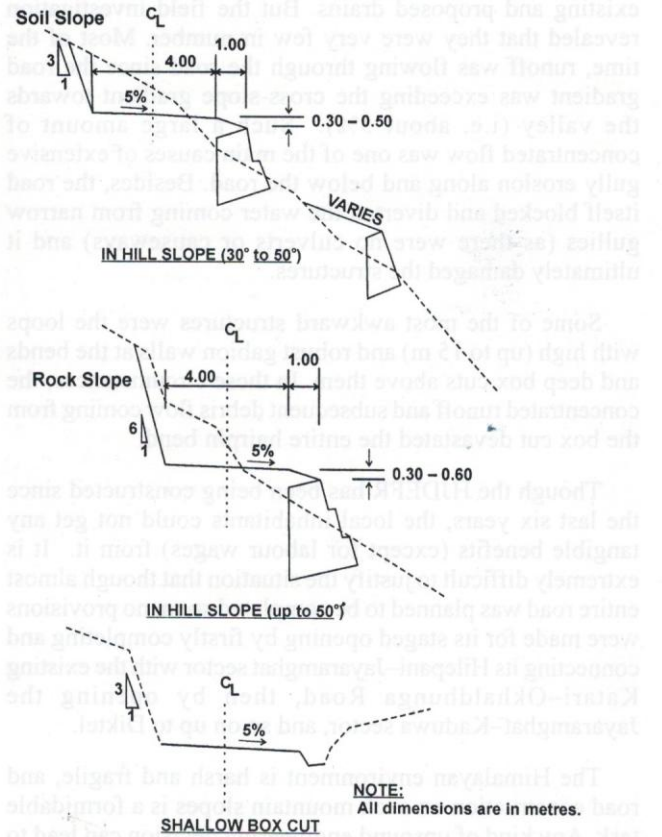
Typical cross-sections for JDEFR (GEOCE et al. 2002). Note missing walls on soil cut slopes.
